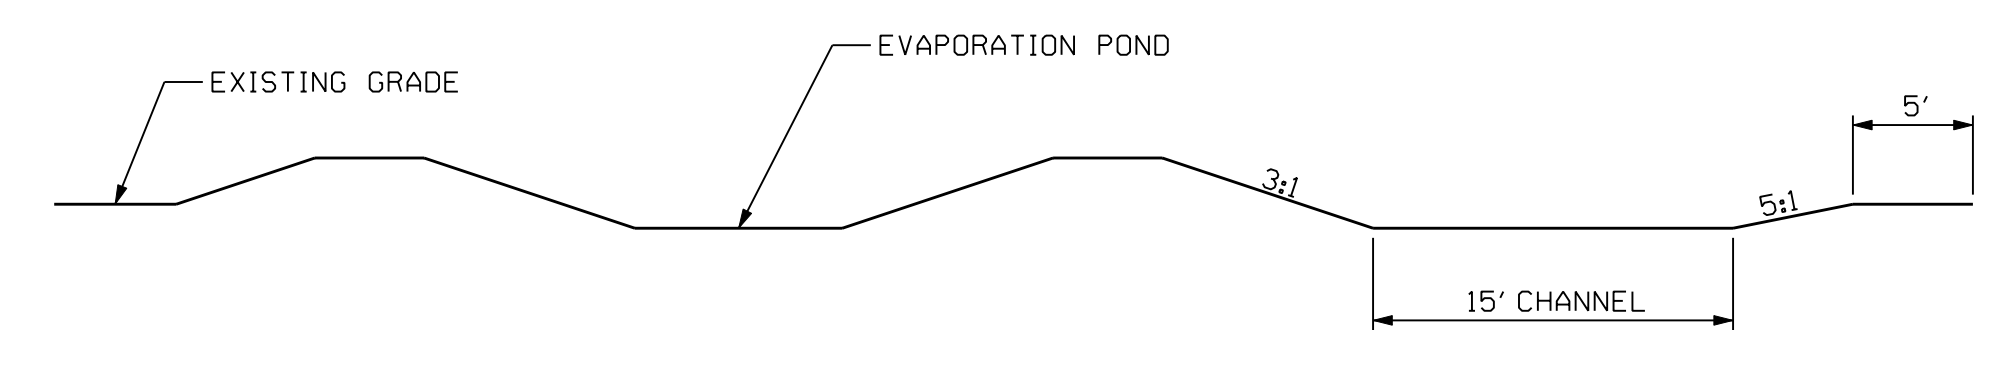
DETAIL E-E RAILROAD CHANNEL OUTLET TO DRY WASH CHANNEL PROFILE
